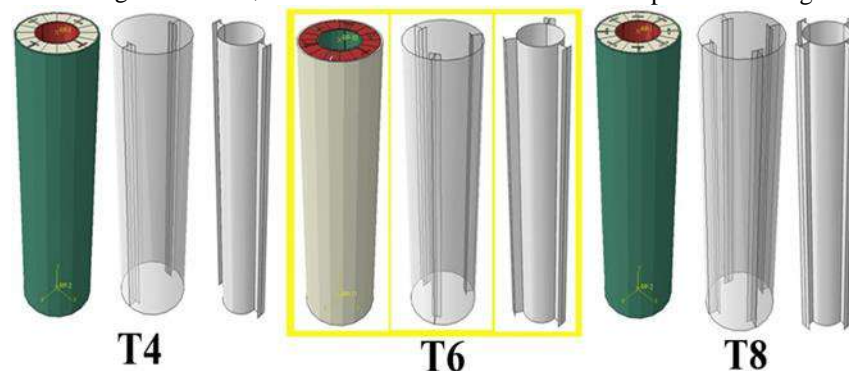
Examples of concrete filled double shell steel columns with continuous T-shaped stiffeners (examples "T4", "T6" and "T8").
